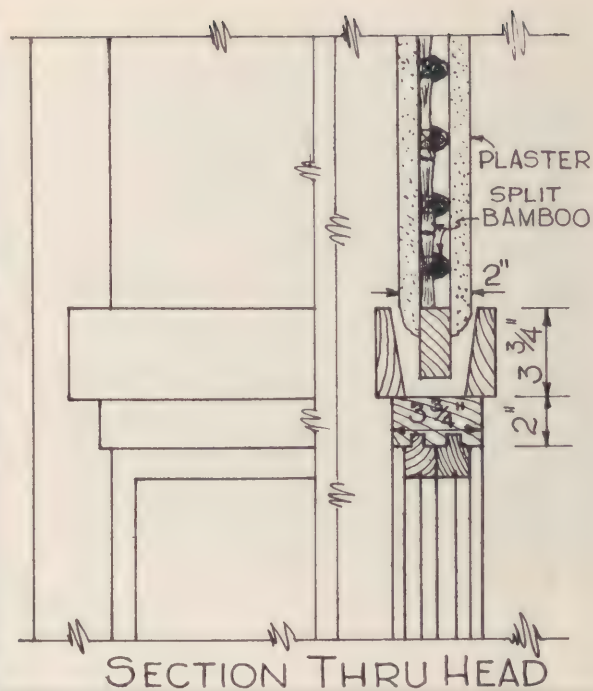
VIII. Japanese residence—Walls and partitions.
